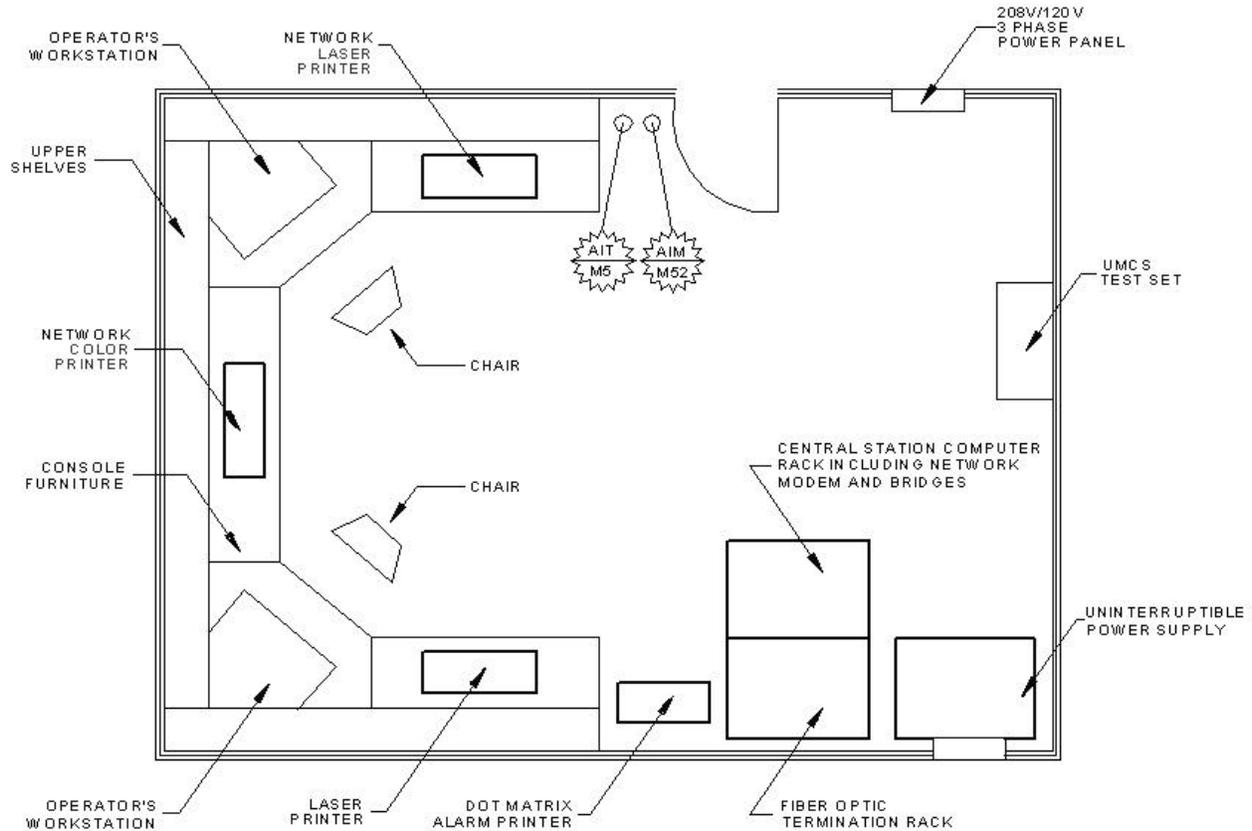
Typical Central Station or Island Station Equipment Room.
